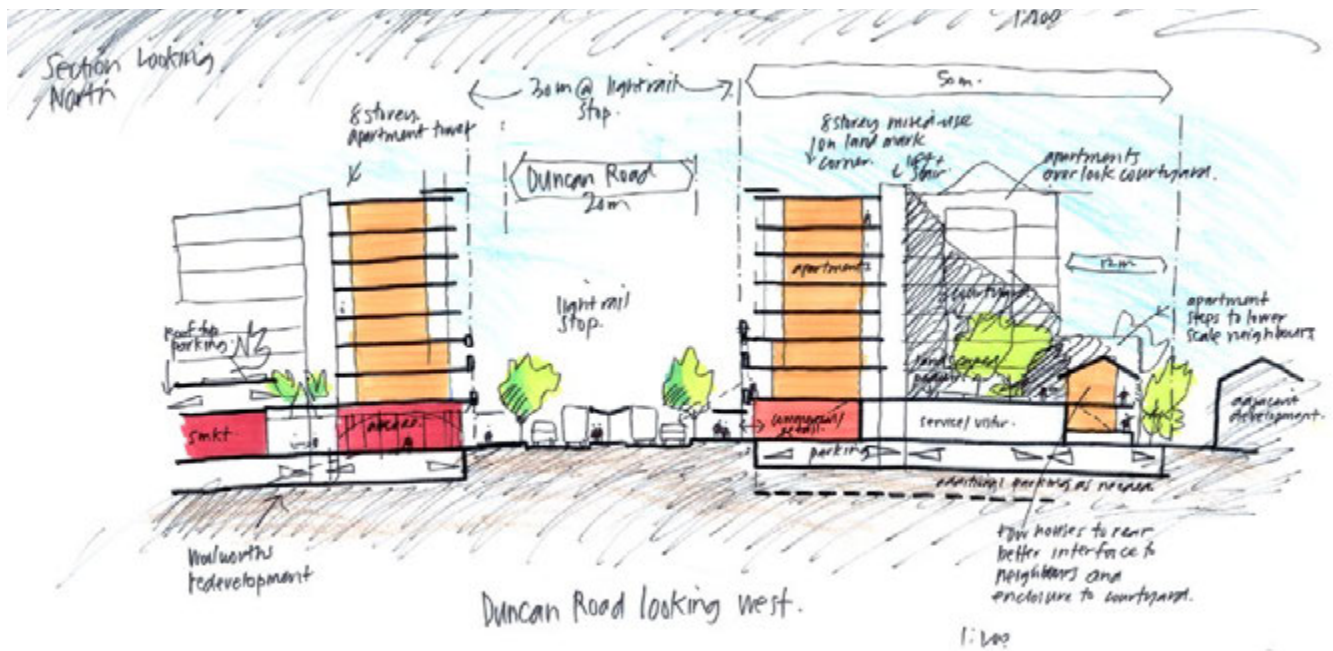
Perth LRT South East Duncan Street Redevelopment Section
